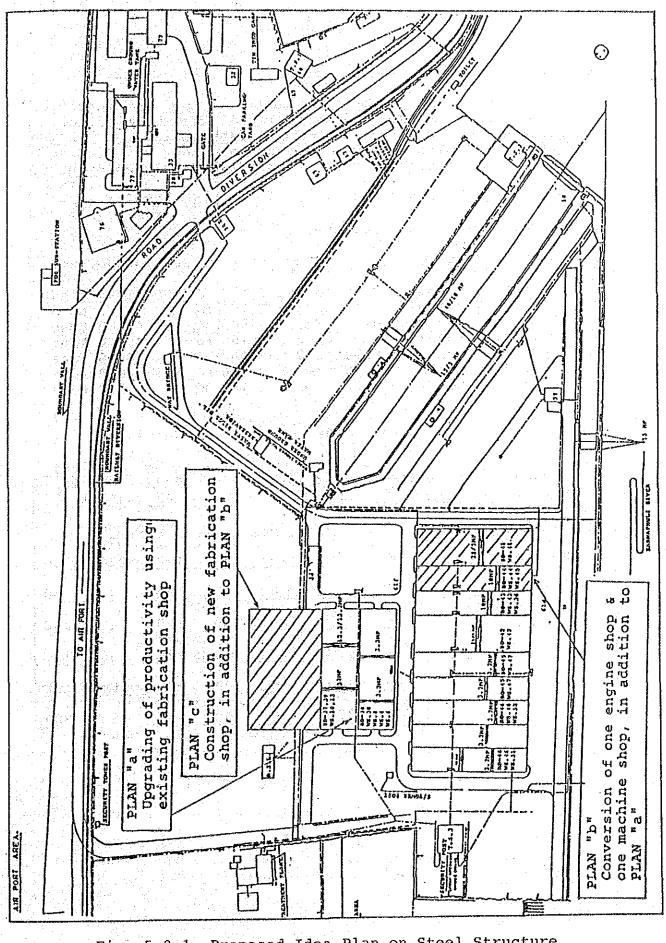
Proposed Idea Plan on Steel Structure Fabrication Shop
